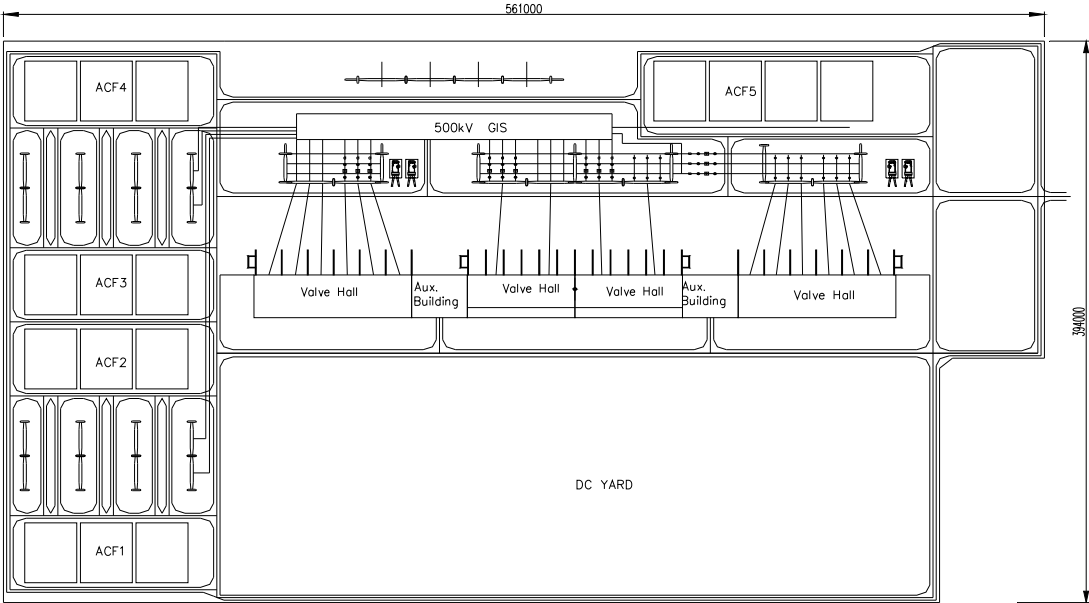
General layout of a typical HVDC converter station with GIS AC yard
